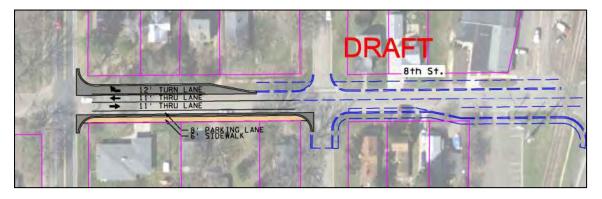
8th Street Alternative 3 – Right Turn Lane at Division – Retain On-Street Parking on South Side – Add Sidewalk
